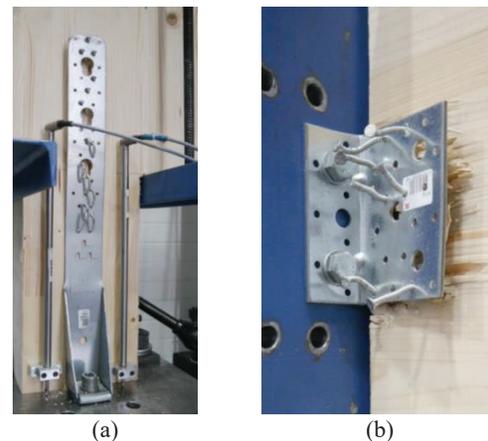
Photo of connection specimens at the end of the tests: (a) hold downs, (b) angle brackets.
